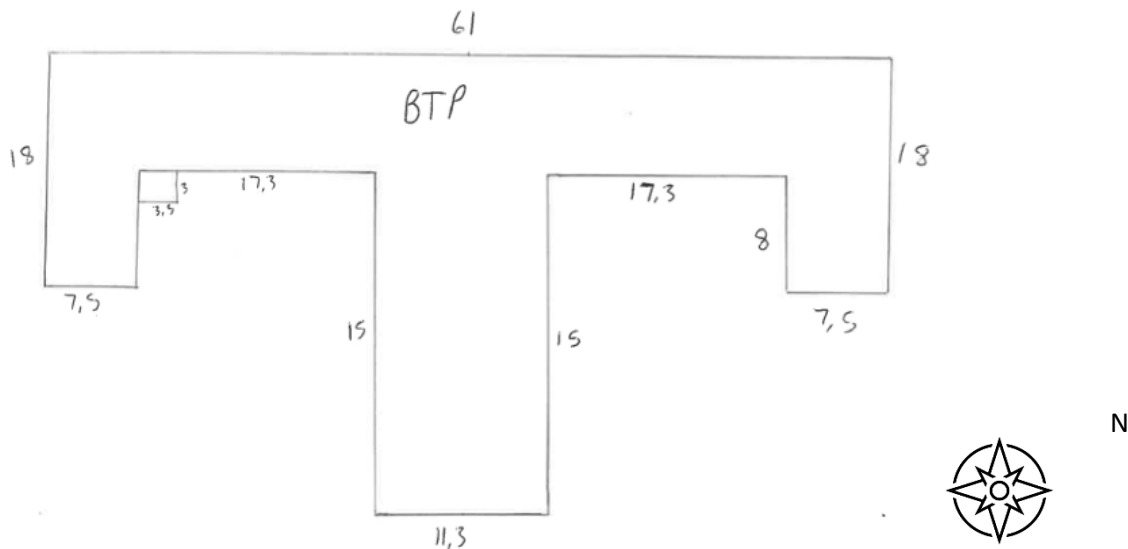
An estimated floorplan of the Biotechnology Platform Building (aka Building 38), ARC Onderstepoort Campus, 100 Old Soutpan Road. Note: Roof measurements for bidders to confirm at mandatory site visit.
